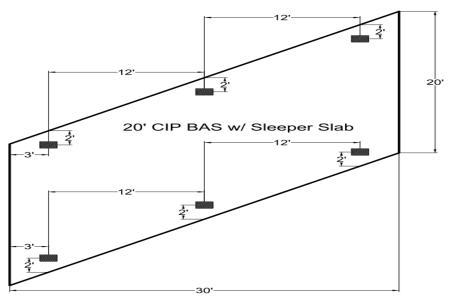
Monitoring Plate Locations for the 20 ft. CIP BAS on Bridge B0563
